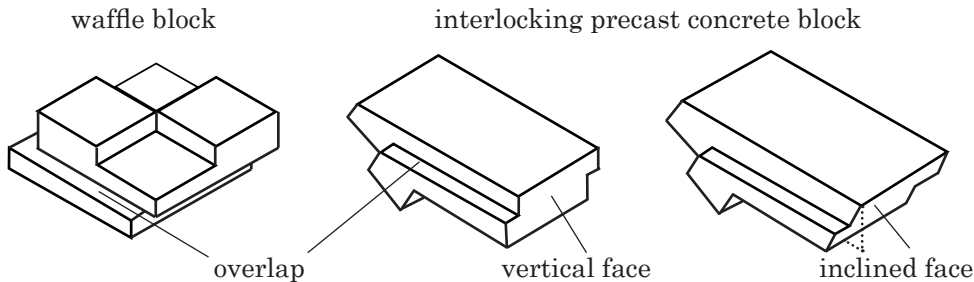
Precast interlocking concrete blocks with stepped surface (waffle block) or vertical and inclined face (Jachowski, 1964).
